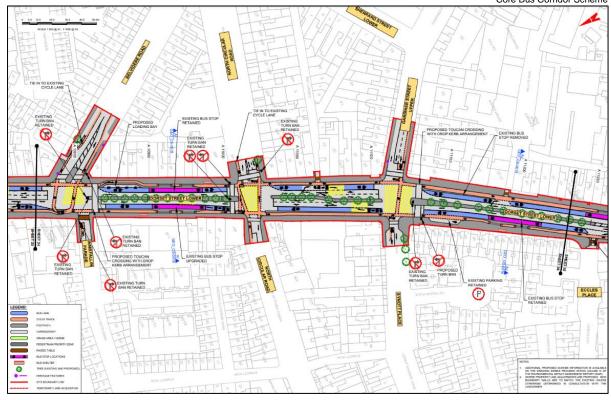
Extract from General Arrangement Drawing (Sheet 34)
